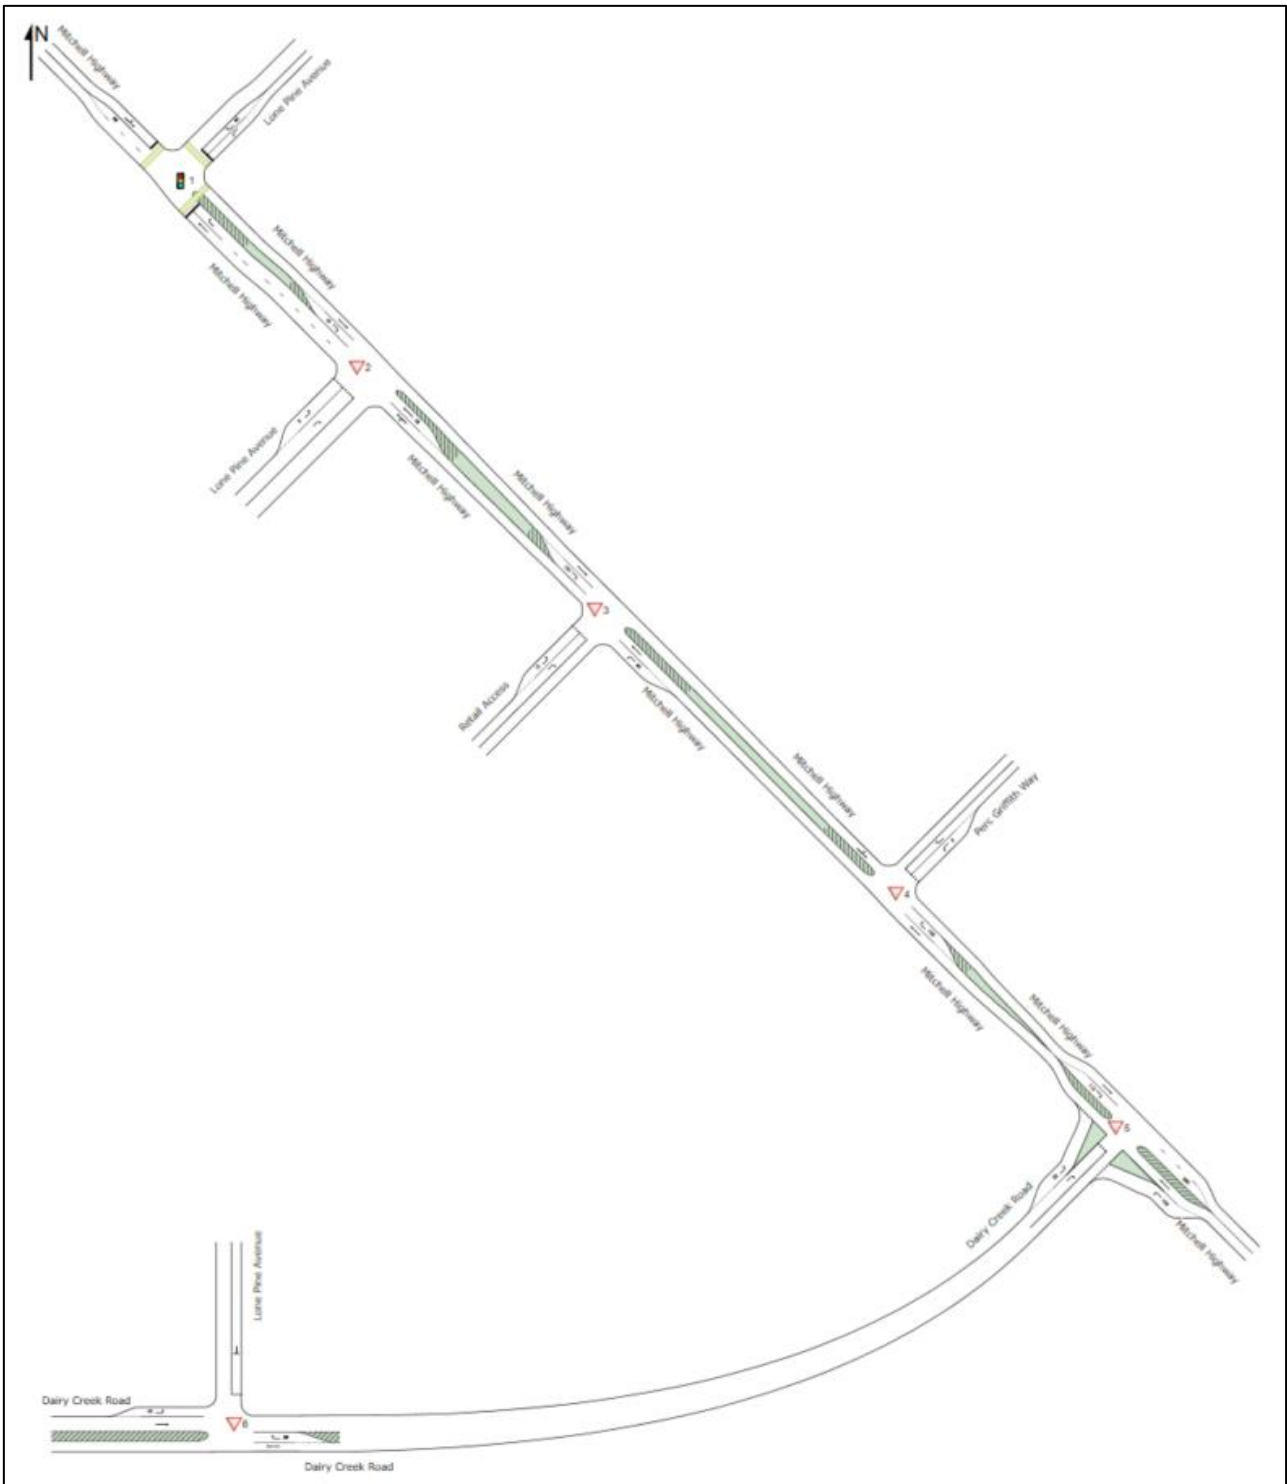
SIDRA Network Layout – Bathurst Road and Dairy Creek Road
